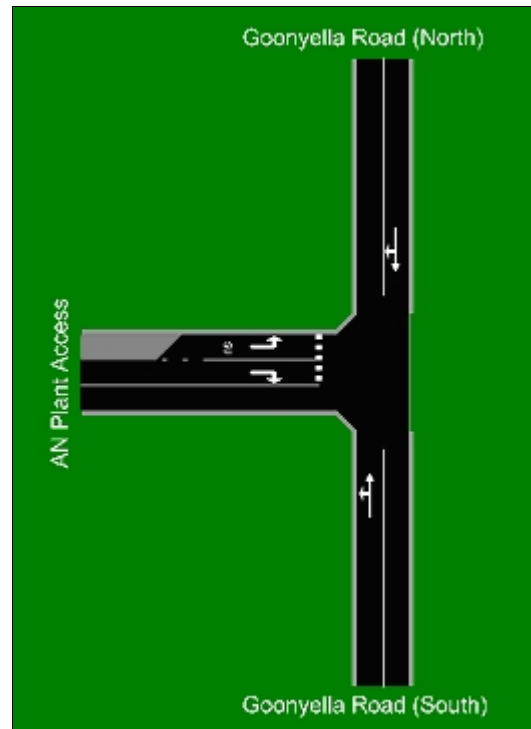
Alternate Plant Access/Goonyella Road Intersection Layout
